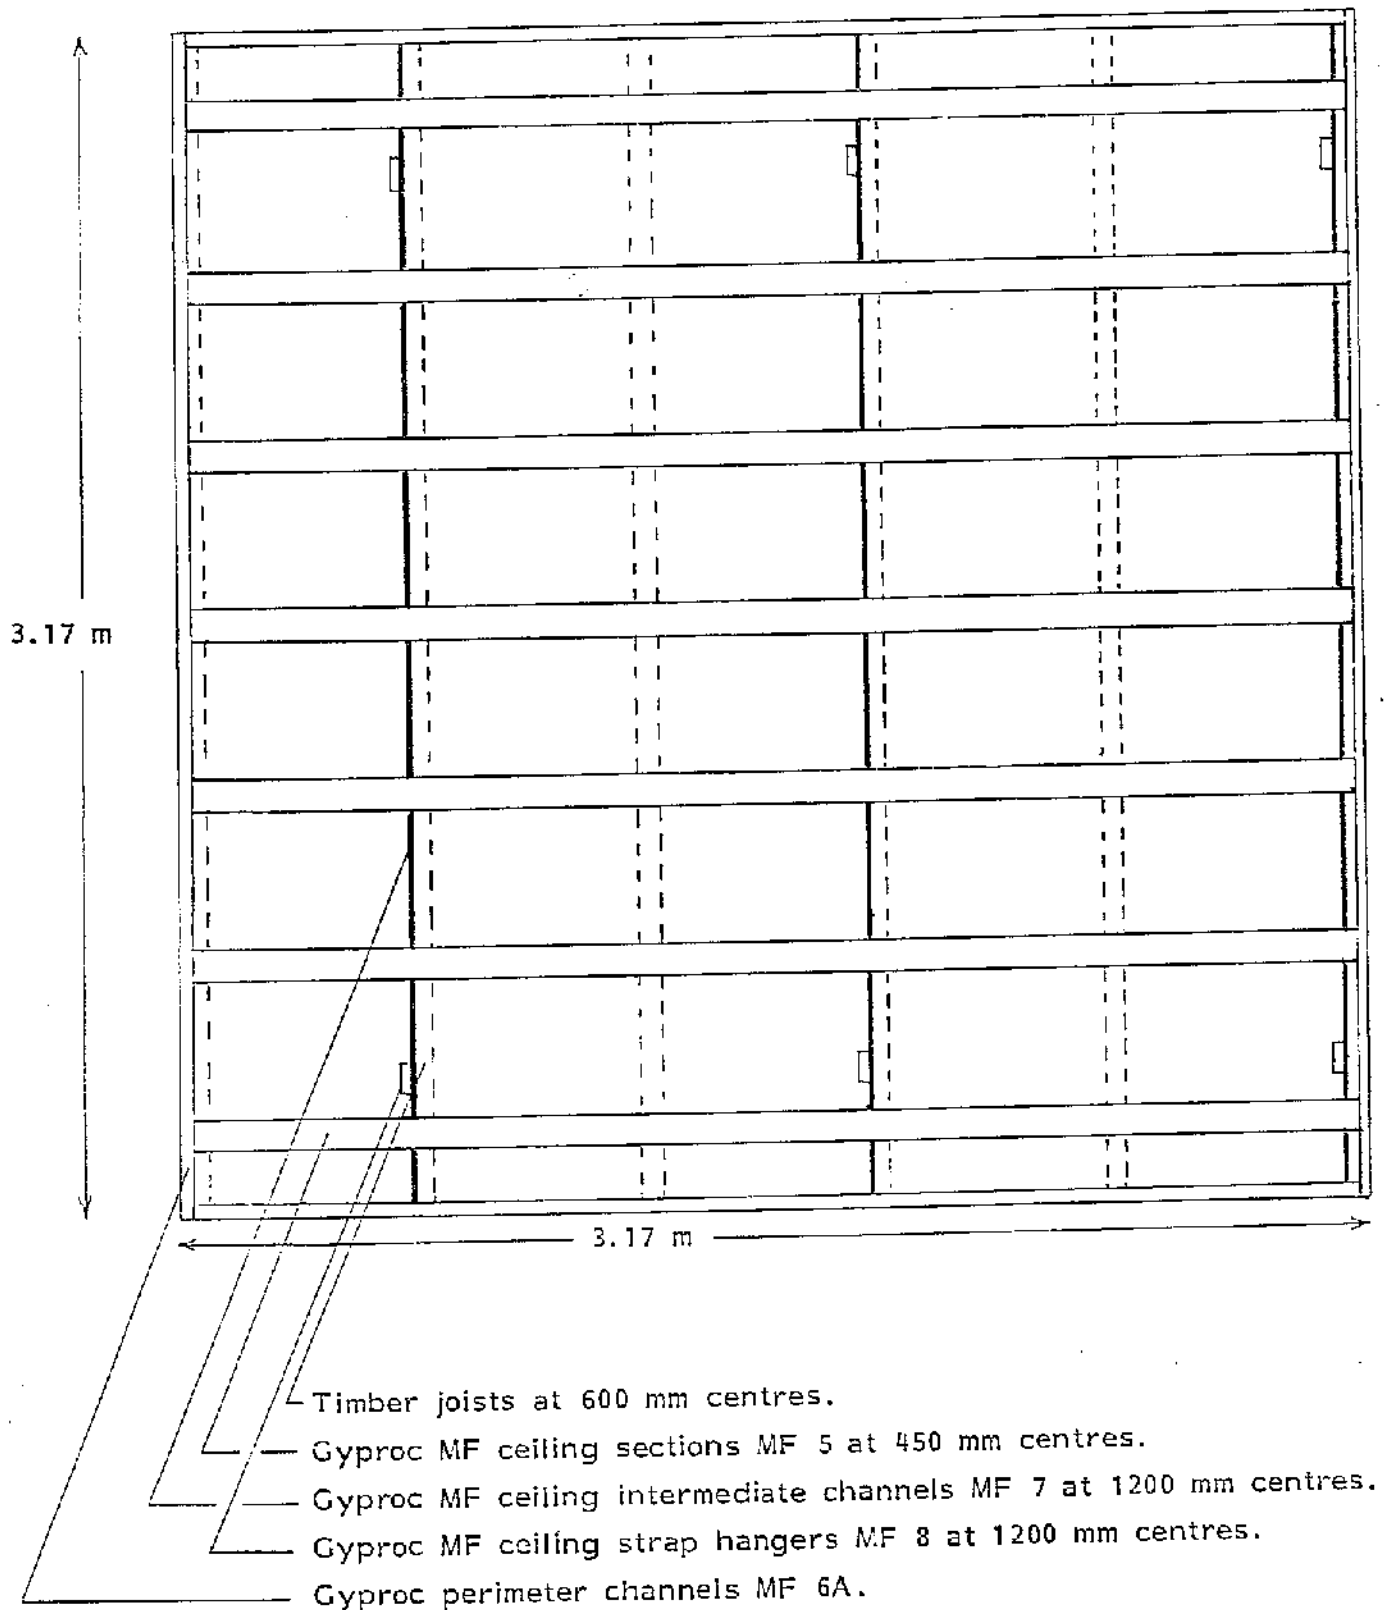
Schematic Plan of Joist Layout and Gyproc MF Ceiling Grid
